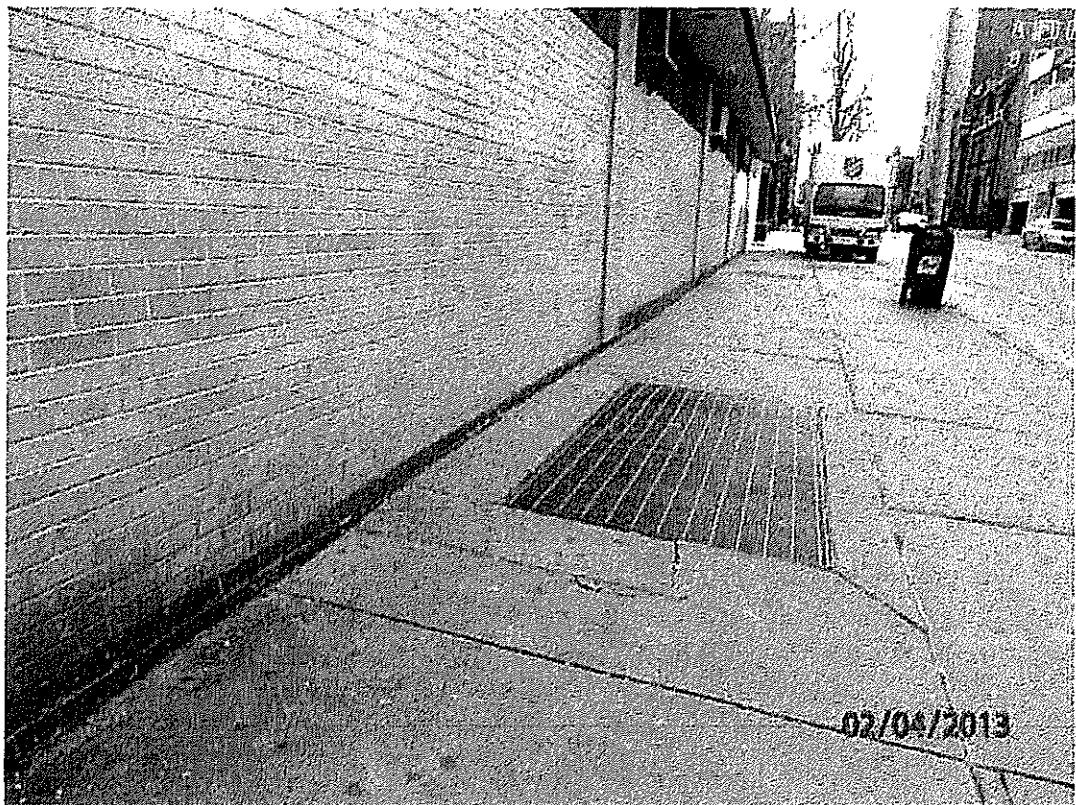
Façade Detail 2140 Market Street, Philadelphia, PA
